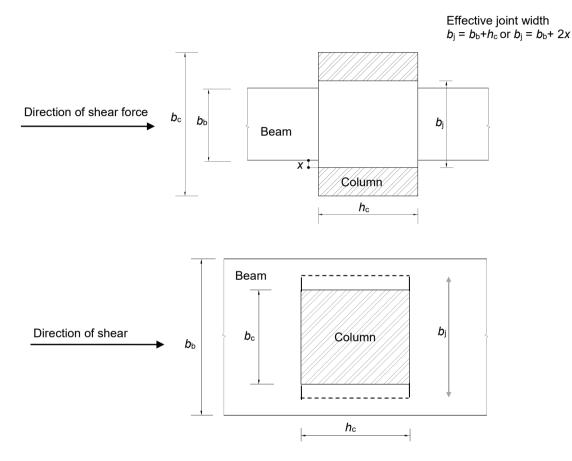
PLAN VIEW OF A BEAM-COLUMN JOINT SHOWING EFFECTIVE BREADTH AND WIDTH OF JOINT
